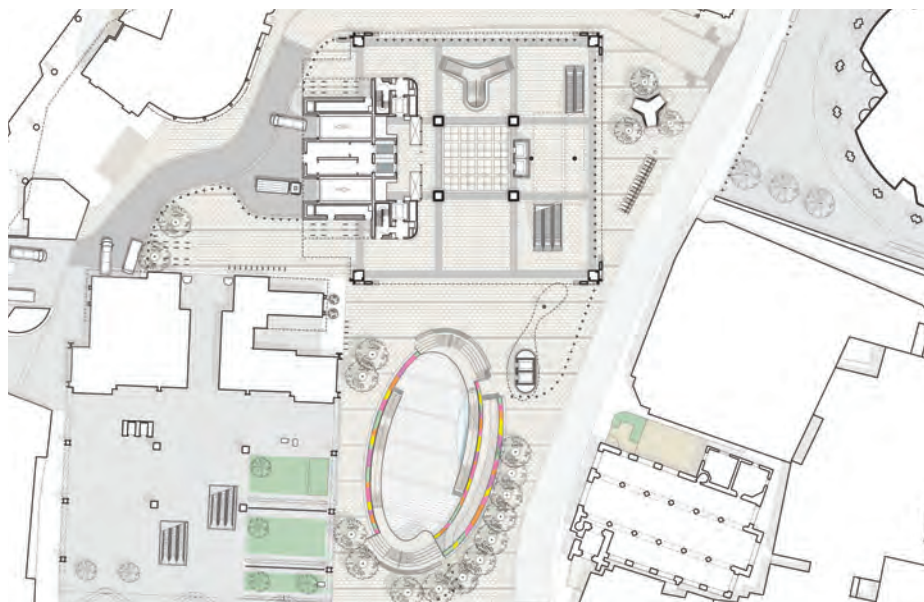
Public realm landscape plan. (Source: Eric Parry Architects)
